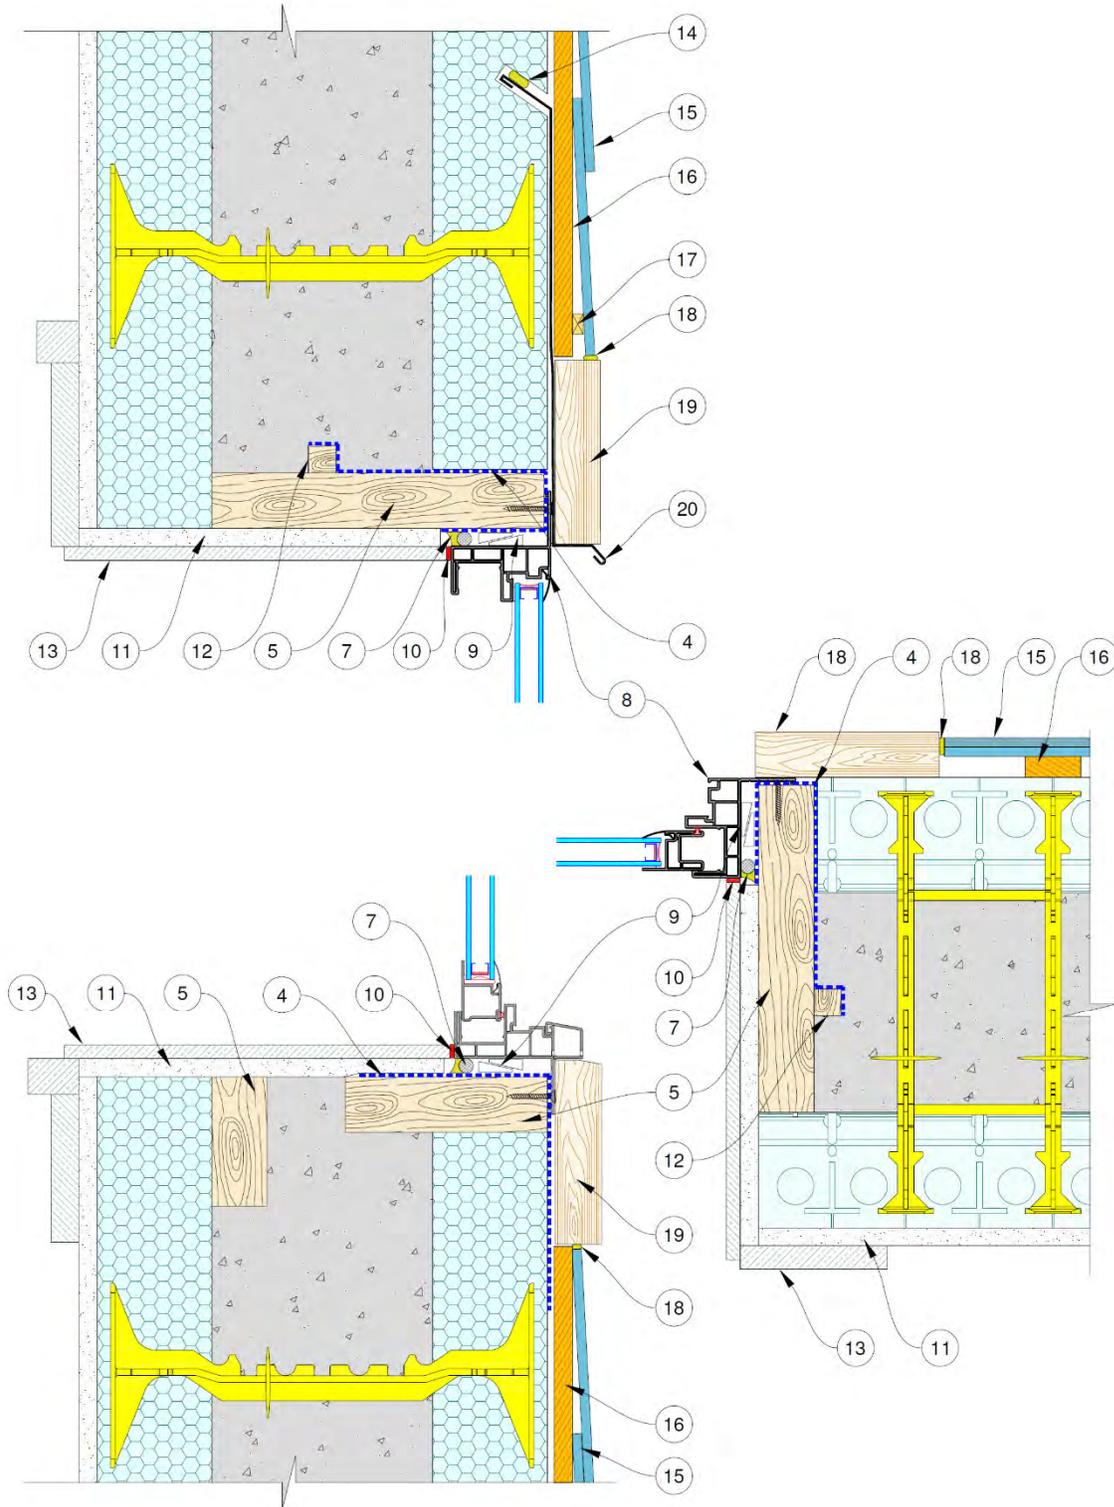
ICF Window Assembly - Wood buck-out, Flanged window flush to exterior, Lapped siding
